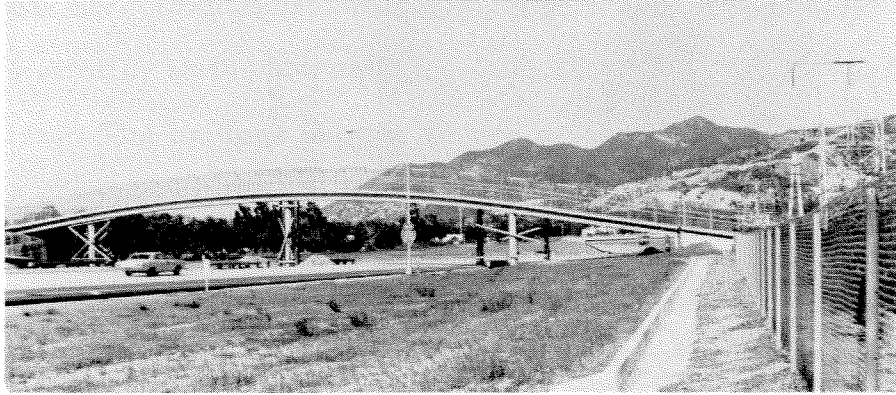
Tyler Street footbridge, Foothill freeway.
